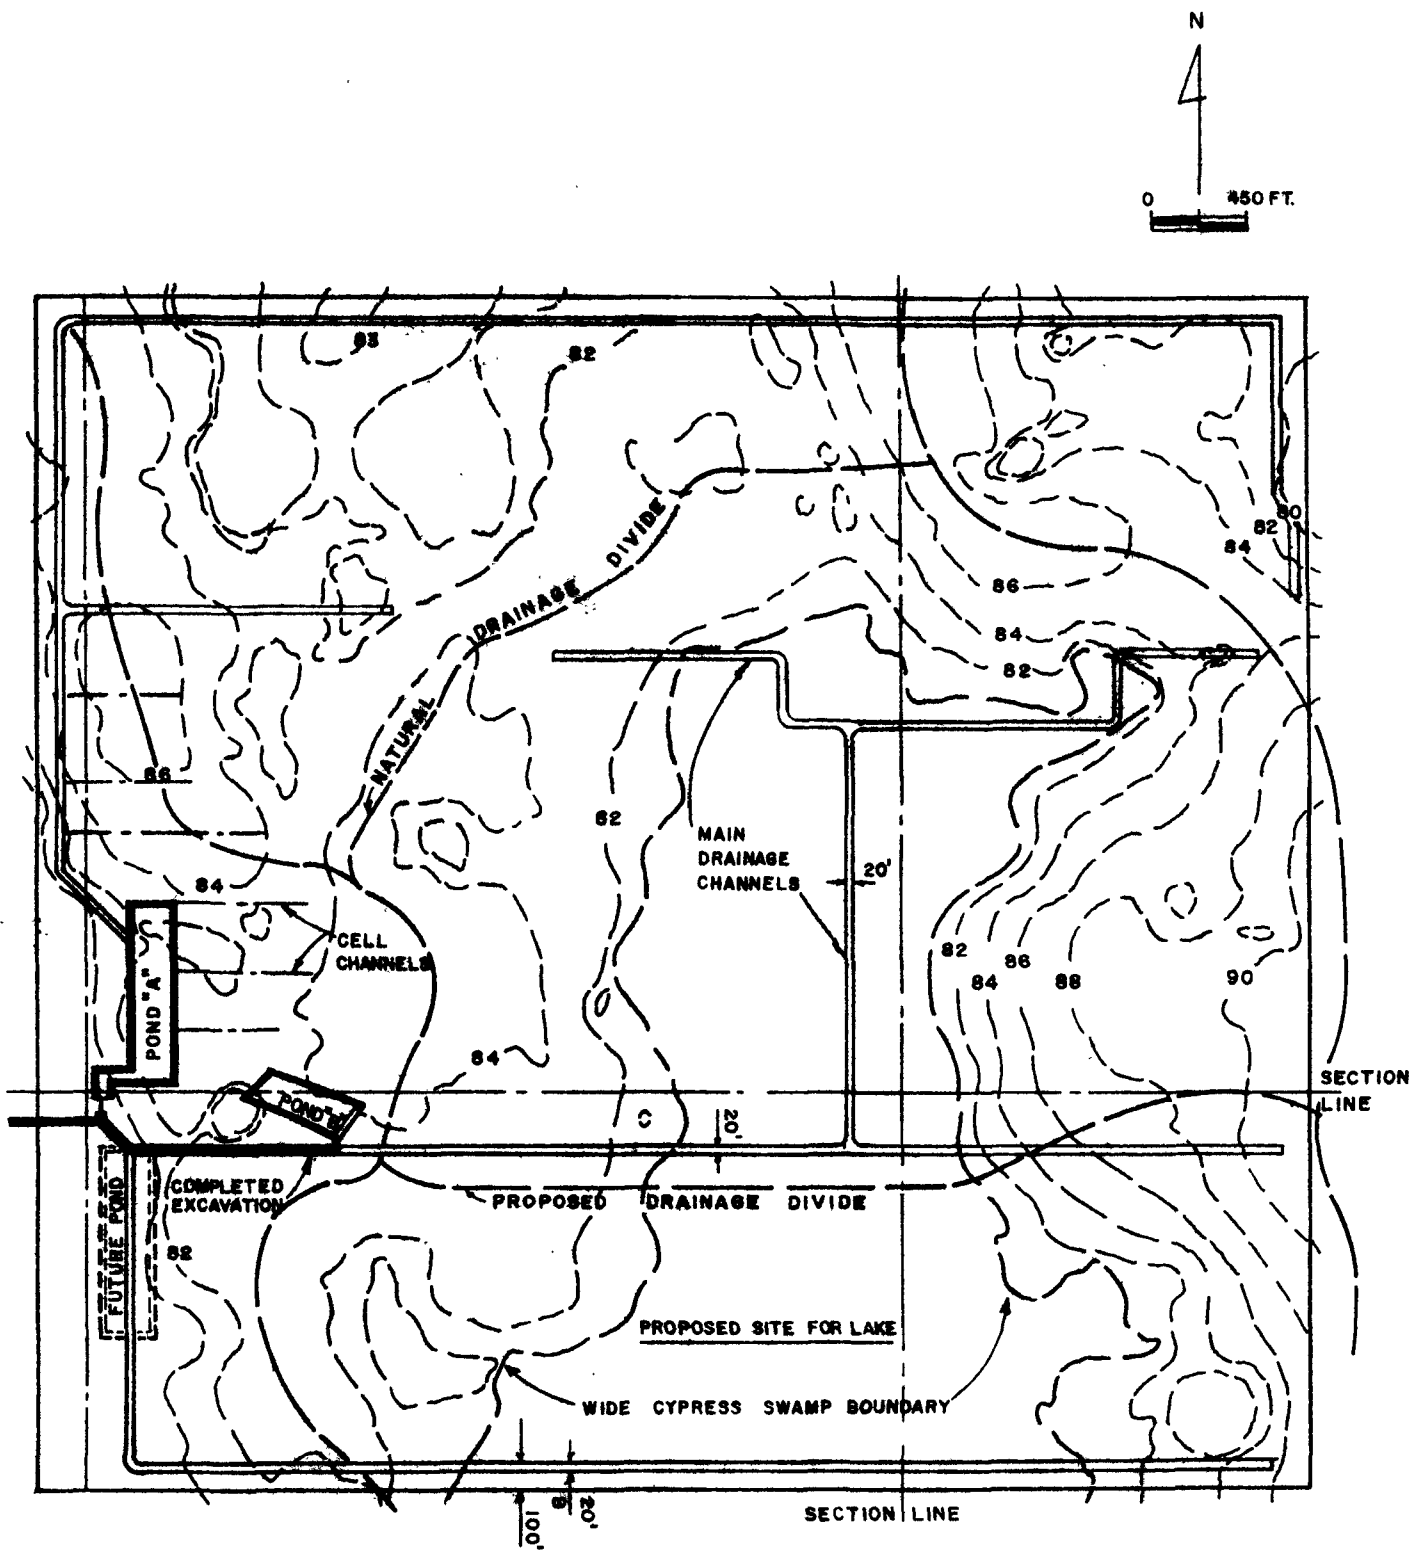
Master Drainage Plan, Orange County Landfill Site.
